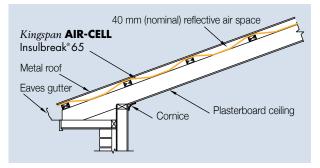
Side elevation of *Kingspan* AIR-CELL Insulbreak[®] 65 in a metal roof with a raked ceiling
